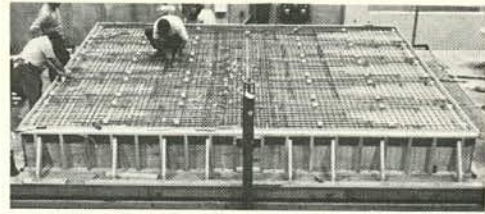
Placement of Reinforcement in Roadway Deck Slab for Specimen SC-3
